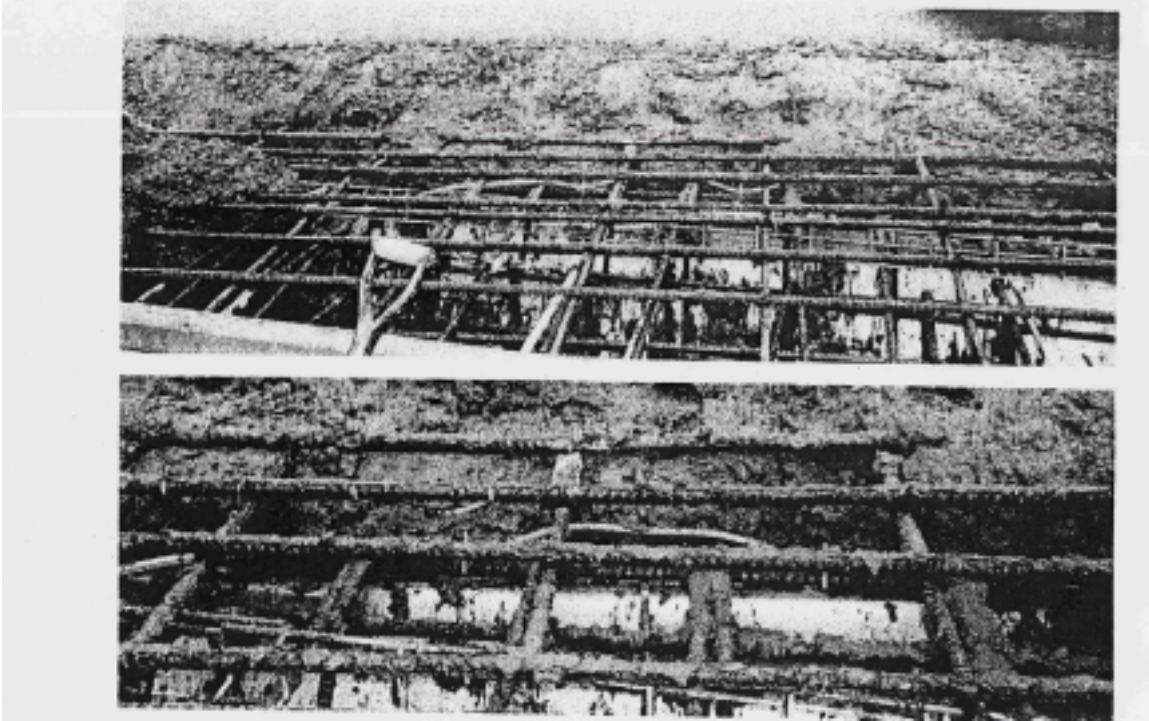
View of Connections at North Main Street Westbound during Concrete Placement
